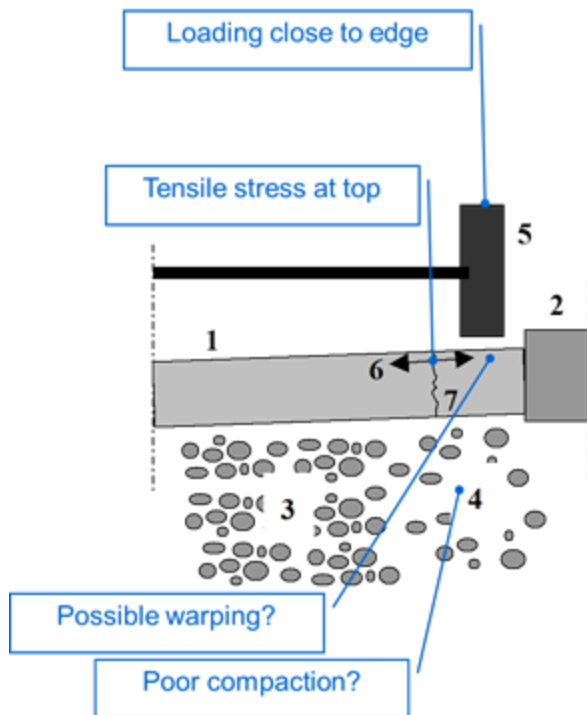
Frequent cracking in concrete slabs at bus stops and possible causes. Löfsjögård & Silfwerbrand (2005). 1 = concrete pavement (here drawn with certain warping, not needed for cracking), 2 = sidewalk, 3 = compacted unbound layers, 4 = insufficiently compacted unbound layers, 5 = bus wheel, 6 = flexural tensile stress in the top layer of the pavement slab, 7 = longitudinal crack.
